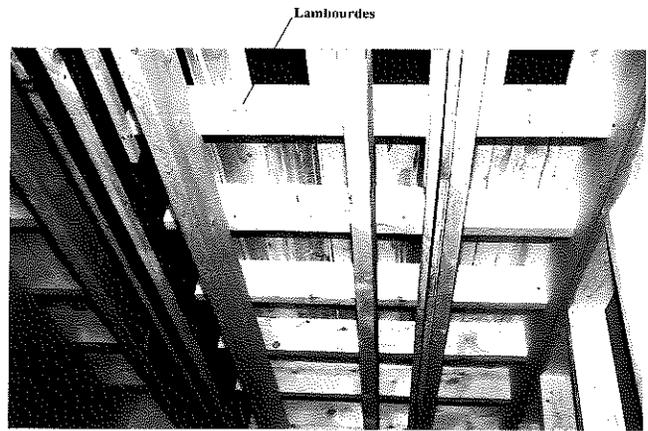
Typical lambourdes assembly during construction. Long joists receive cross members called lambourdes. Black panels are dividers between cavities.
